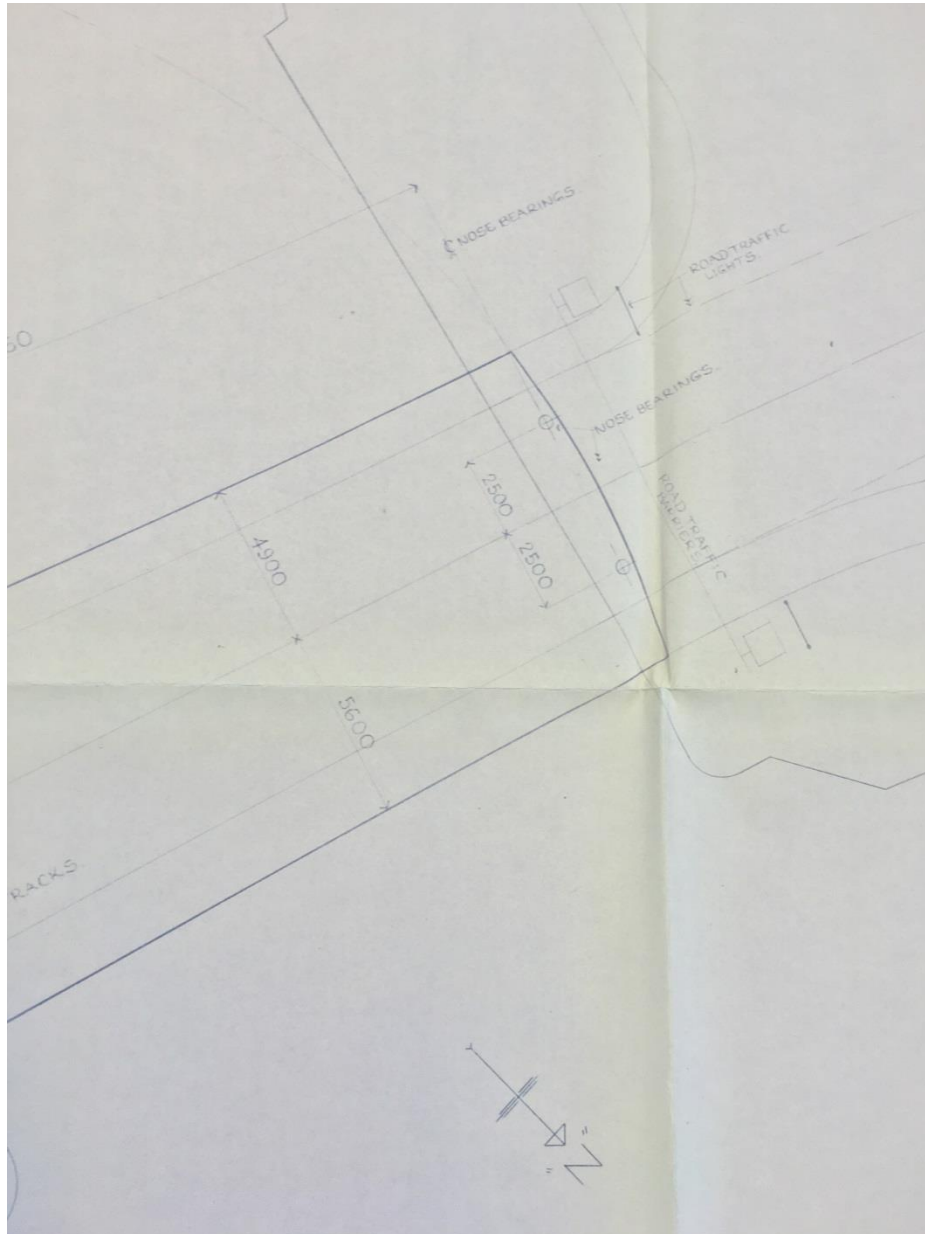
Replacement Swing Bridge for Wellington Dock, Tender Drawing, Dated, c.1978, DHB Historical Drawing Archive Ref:7563/2.
